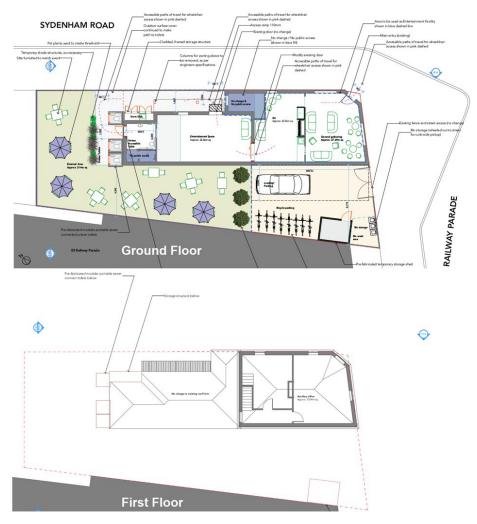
Proposed Ground First Floor Plans, Studio Trobec
